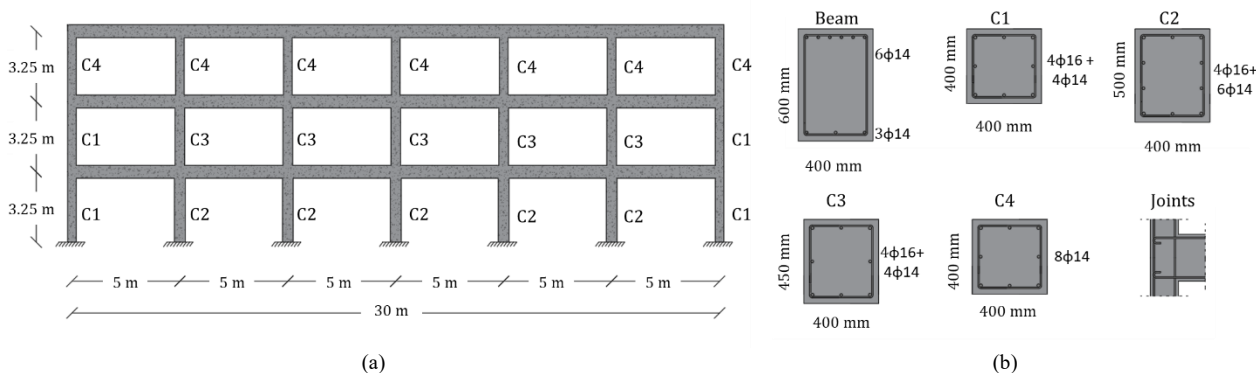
(a) Geometric details of the analysed RC frame and (b) its structural members – C1-4: columns and Beam.
